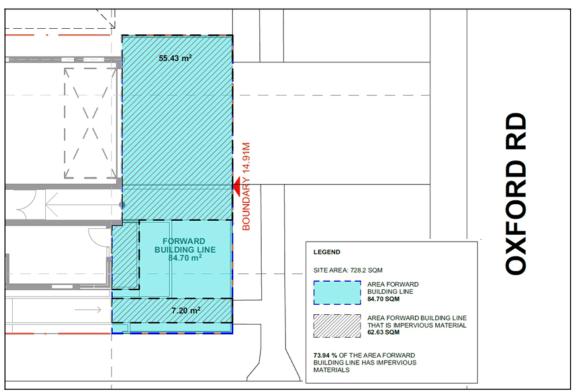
Plan showing the amount of landscaping forward of the Oxford Road building line.
